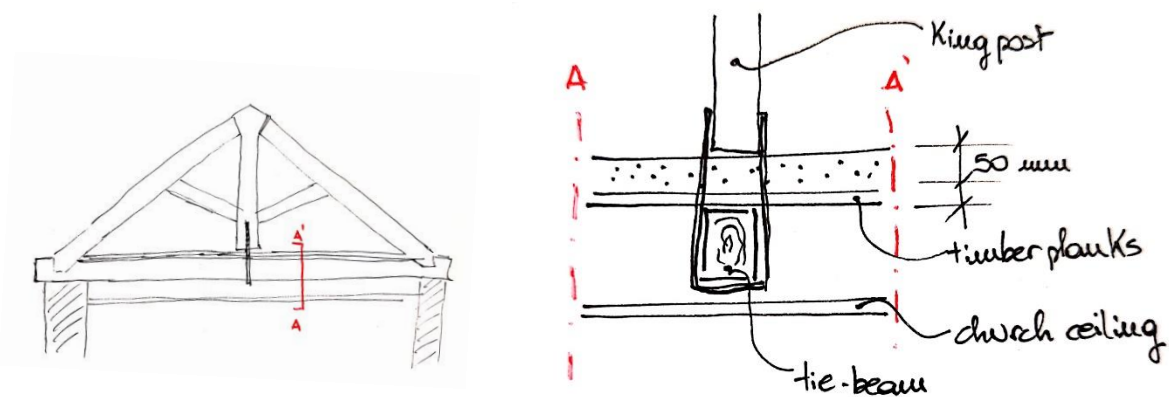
Sketch representing a probable layer arrangement for the attic floor slab and its relationship with the elements of the roof trusses
